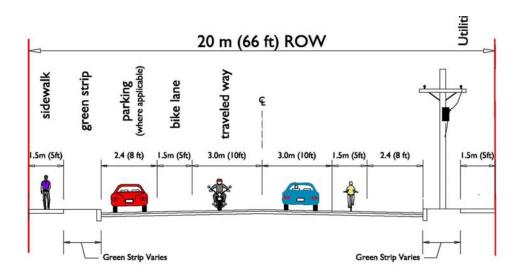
Proposed Southern Cross Section - Parking Alternative with Bike Lanes.
